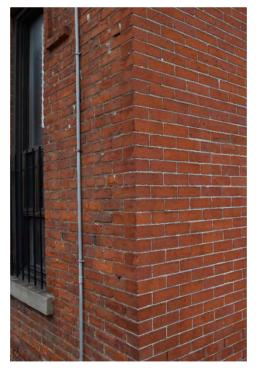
The southeast corner of the Parsonage showing the difference in brick bonding between the east façade (right) and south façade (left).
